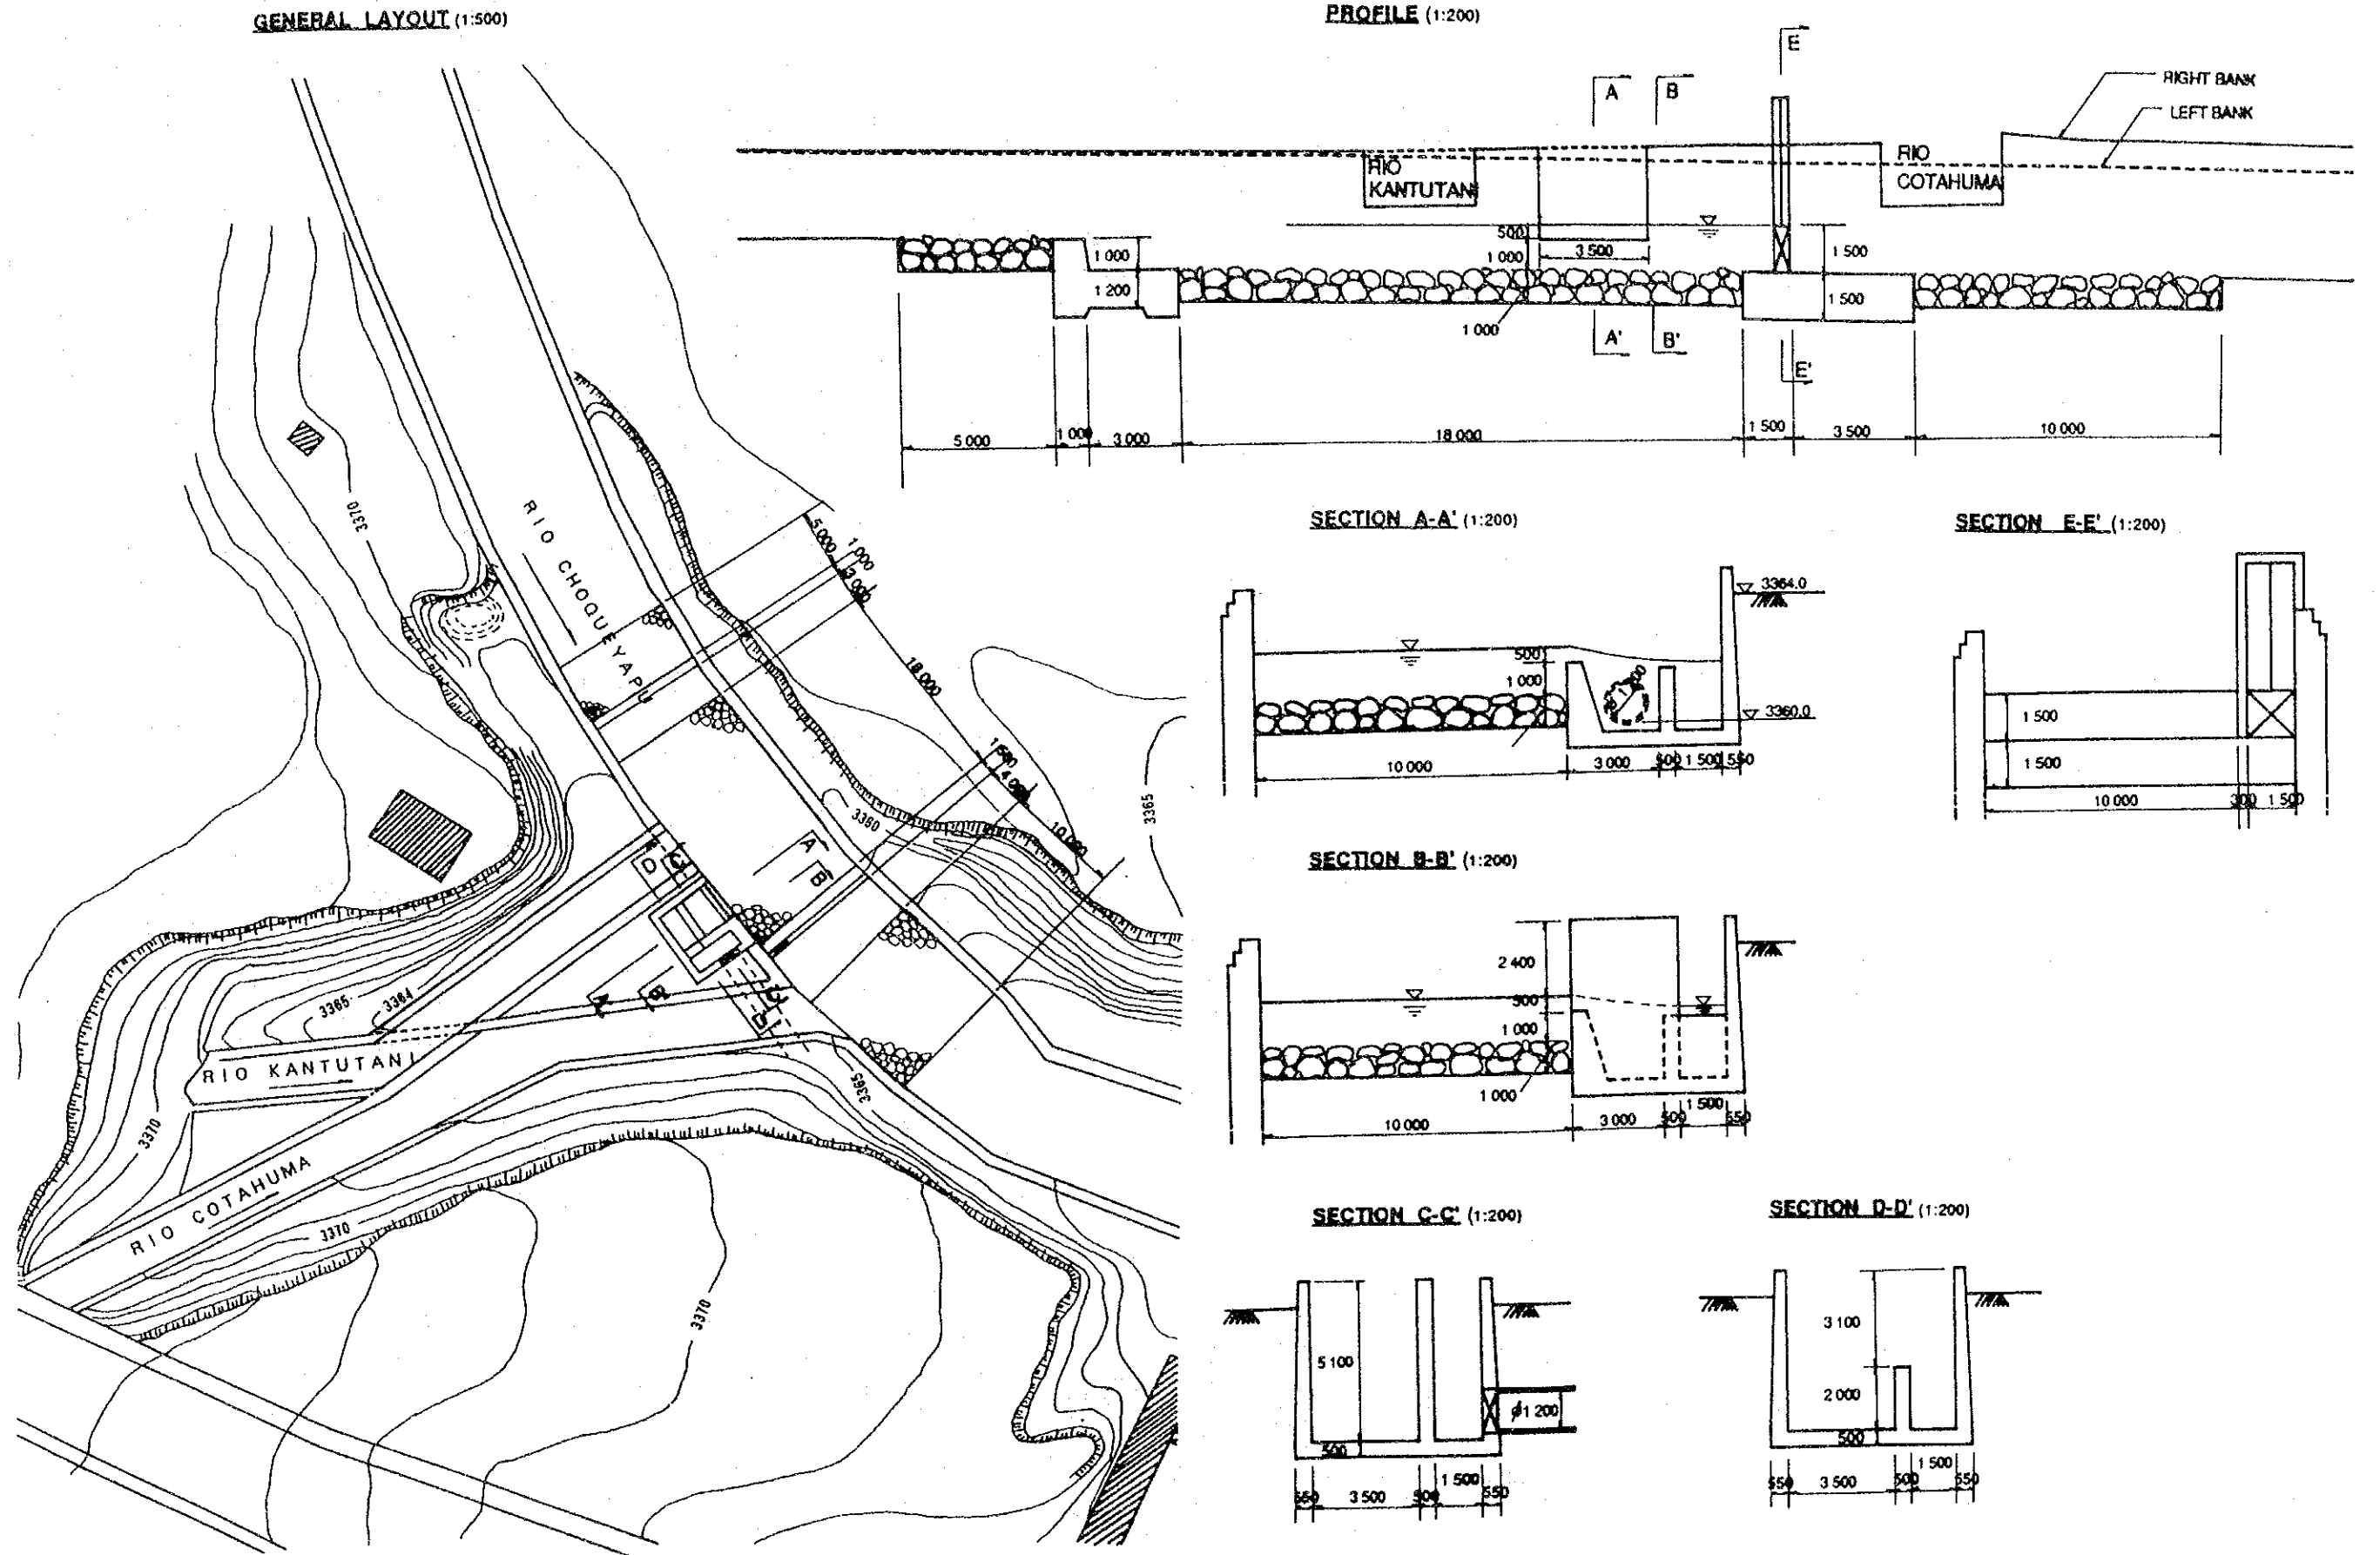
GENERAL LAYOUT AND PROFILES OF WATER INTAKE FACILITIES
